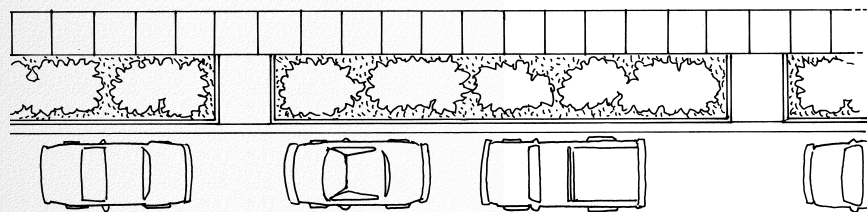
If on-street parking is permitted, periodic curb ramps along a planting strip can facilitate pedestrian access onto the sidewalk.
